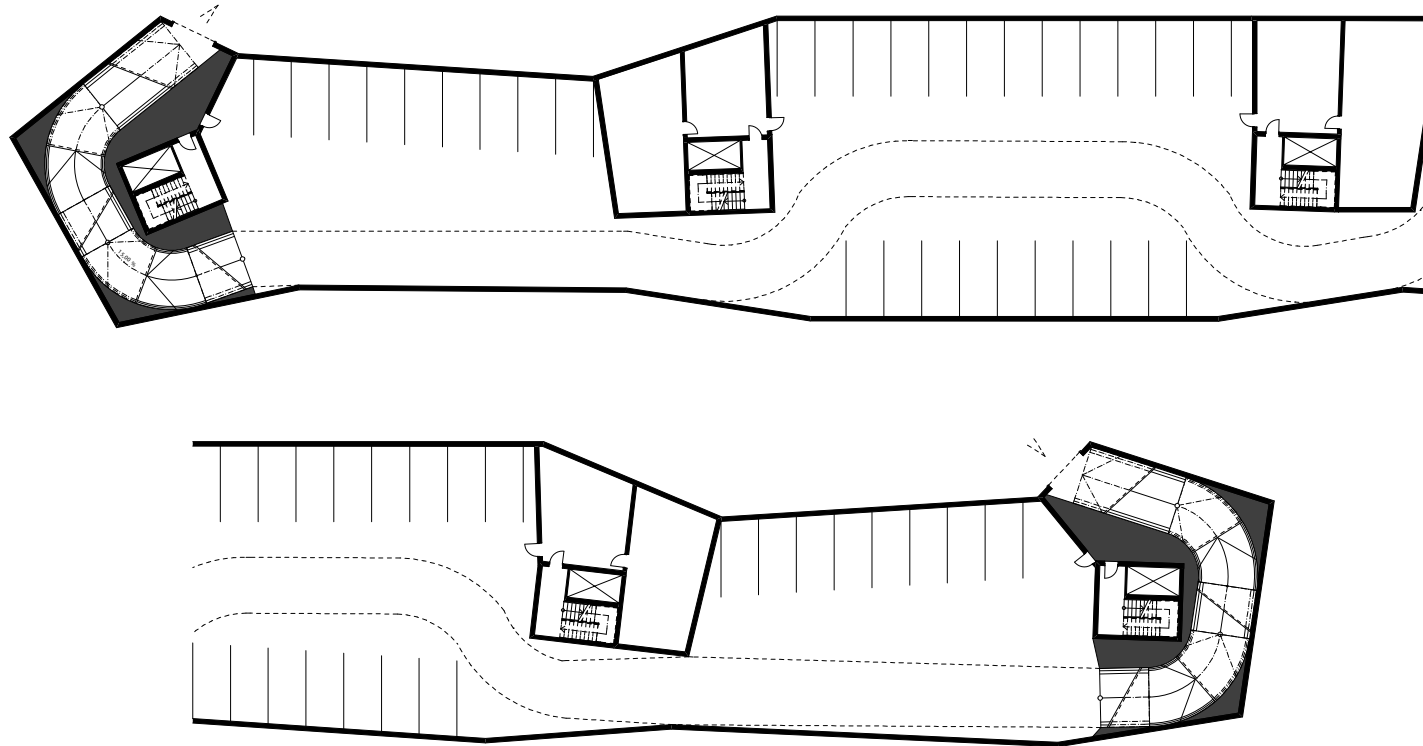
Design proposal of the cellar plan. Featuring underground parking and ventilation rooms, 1:500
